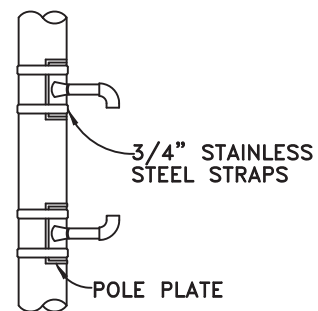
DETAIL OF MAST ARM MOUNTING FOR IN-LINE SIGNAL HEAD (3-SECTION OR 5-SECTION)
